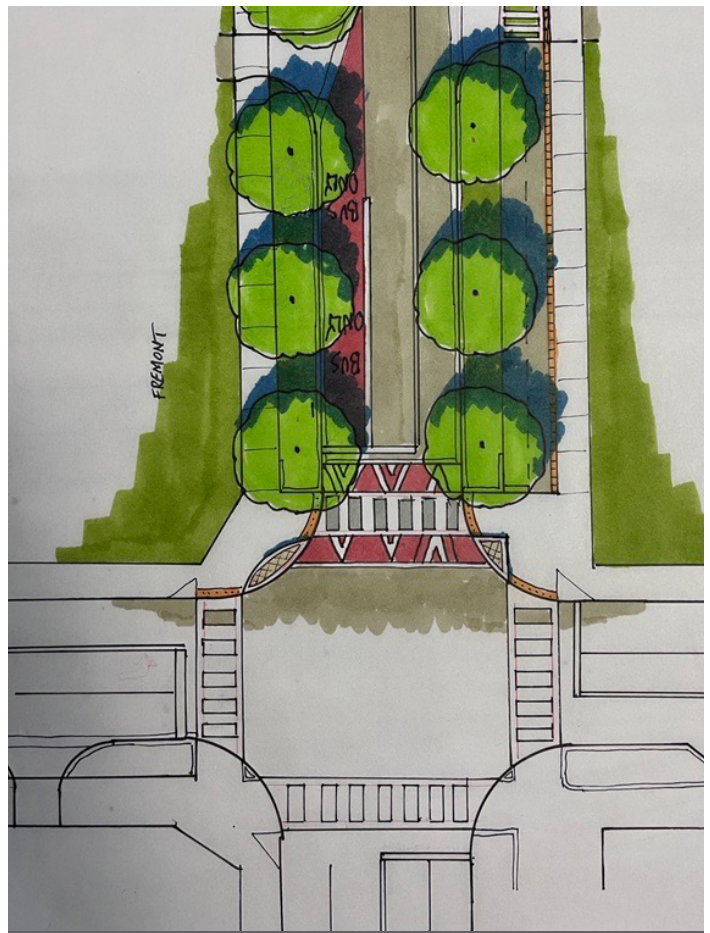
Proposed intersection plan for Fremont Avenue and Alhambra Road
